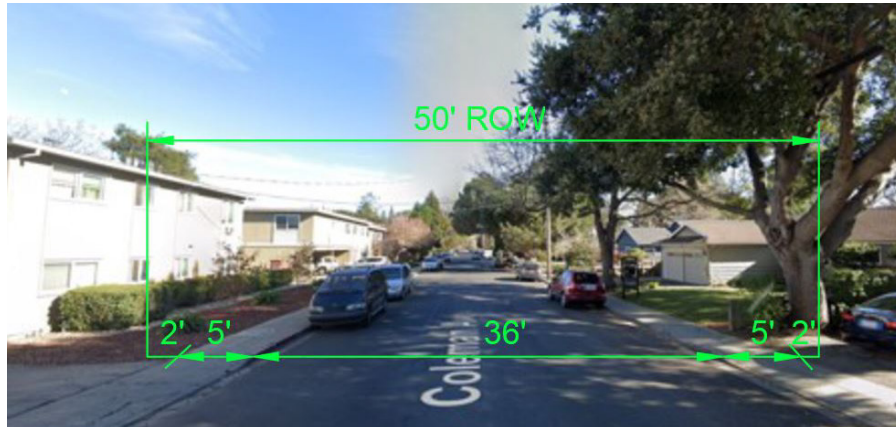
Coleman Avenue East of Santa Monica Avenue (City of Menlo Park) Looking East
